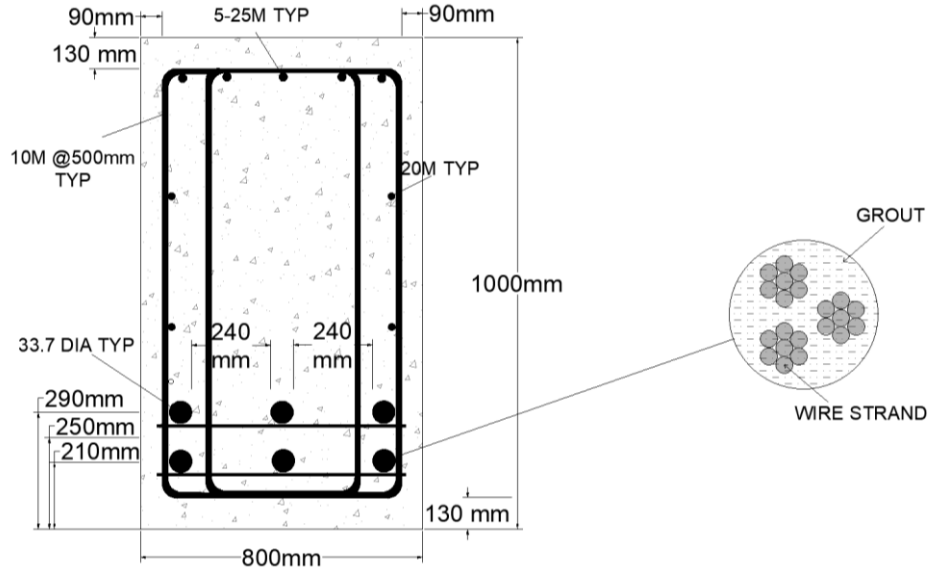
Cross Section of Post-Tensioned Tie girders (Alternative I)
